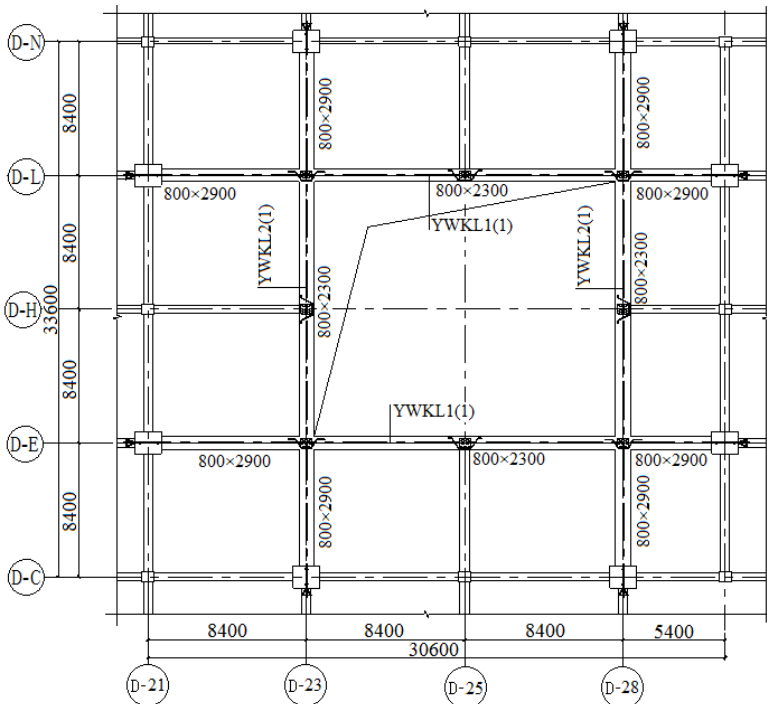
Layout plan of prestressed beam with elevation of 1.900
